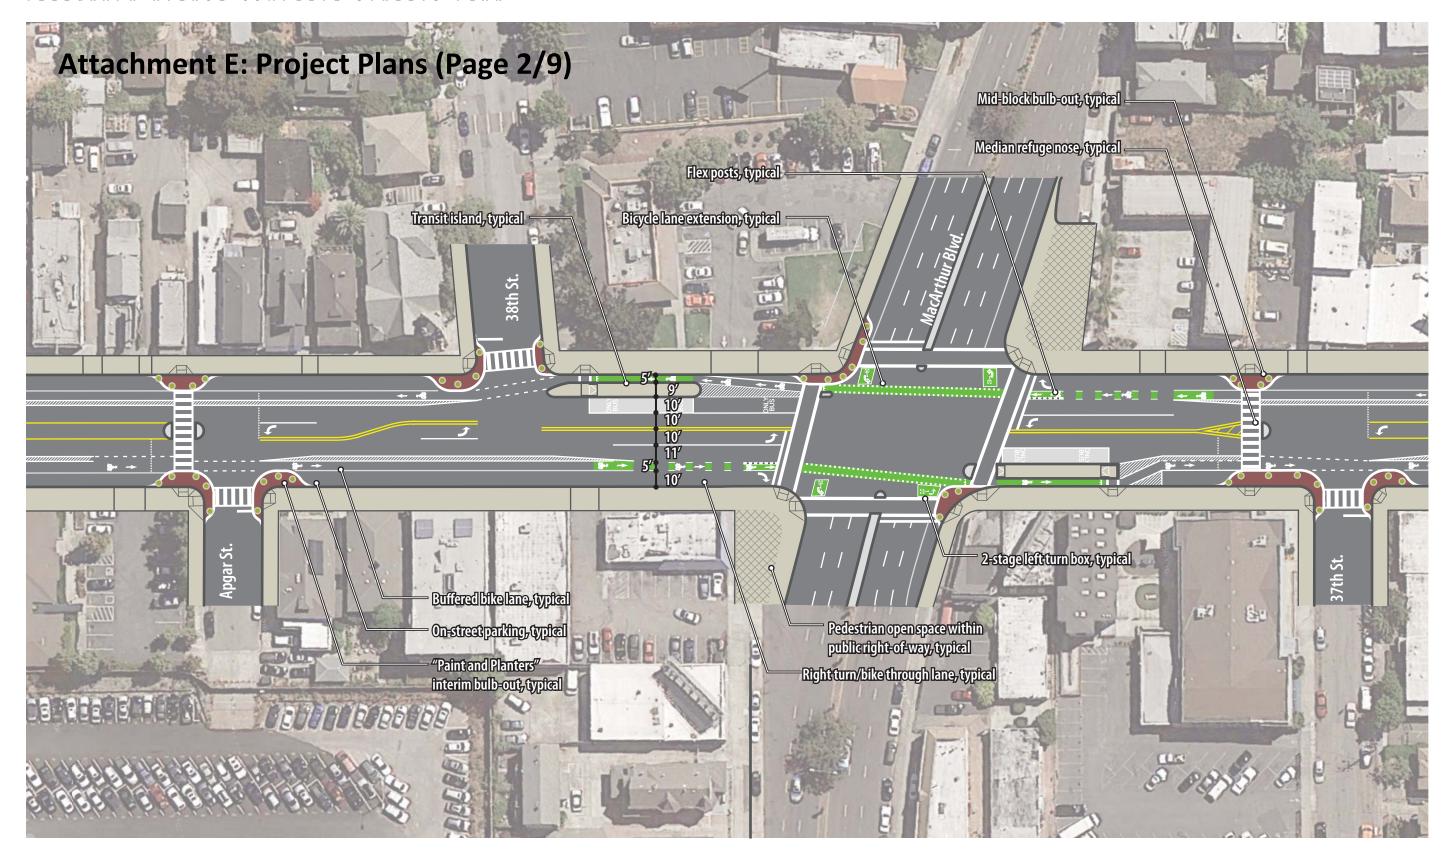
Final Concept Plan Segment Drawings - Apgar Street to 37th Street
